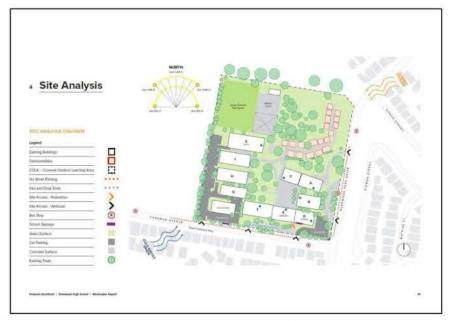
Existing site layout for Glenwood High School. (Source SINSW/Pedavoli Architects 2020).
